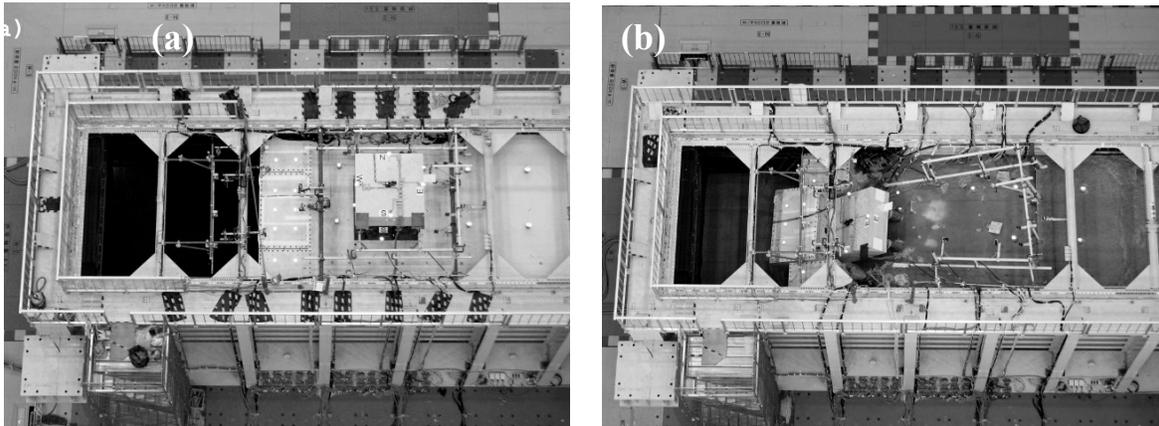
Caisson, pile-supported structure and their surroundings (a) before shaking and (b) after test completion.
